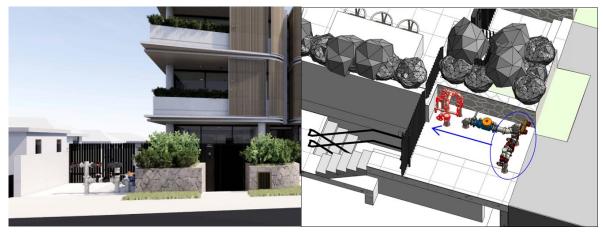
Front façade perspective from Burge Street of the proposed fire hydrant and booster.
